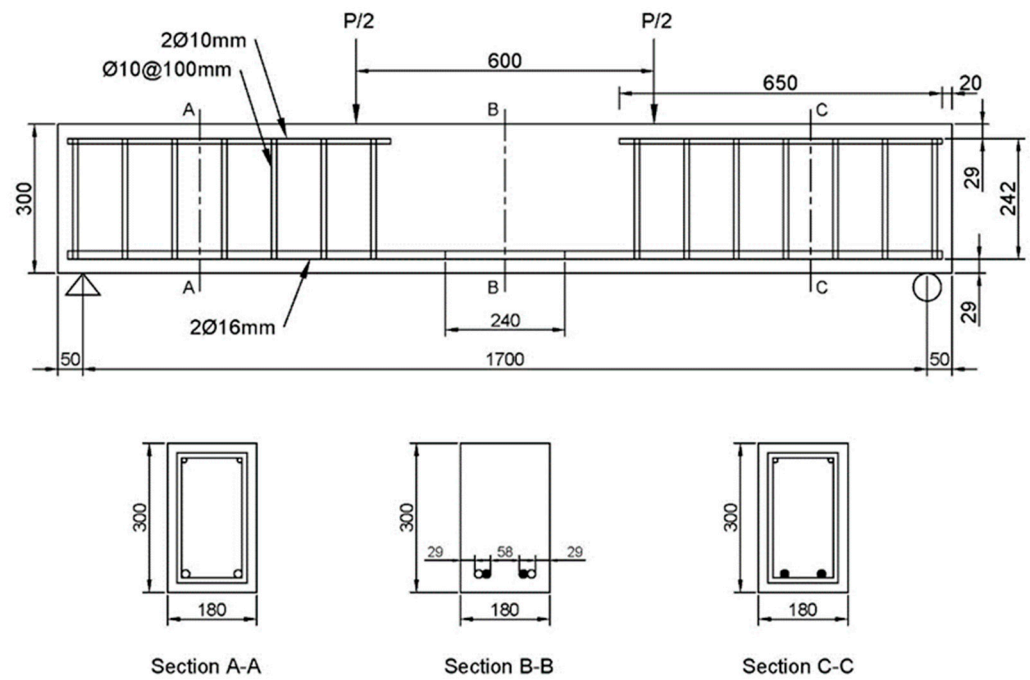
Beam specimen details for group (2) with splice length of  $15 d_b$  (240 mm).
